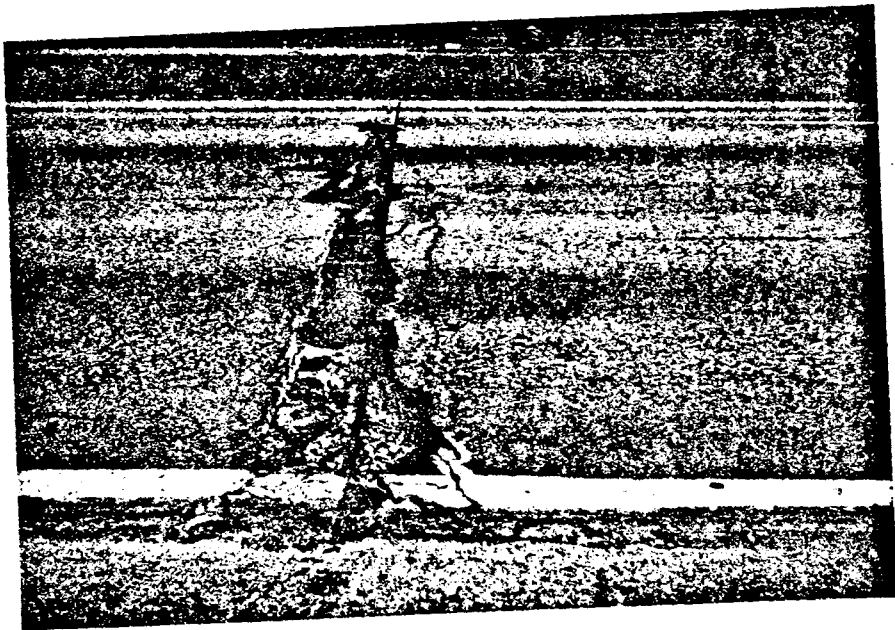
JOINT SPALLING "D" CRACKING
